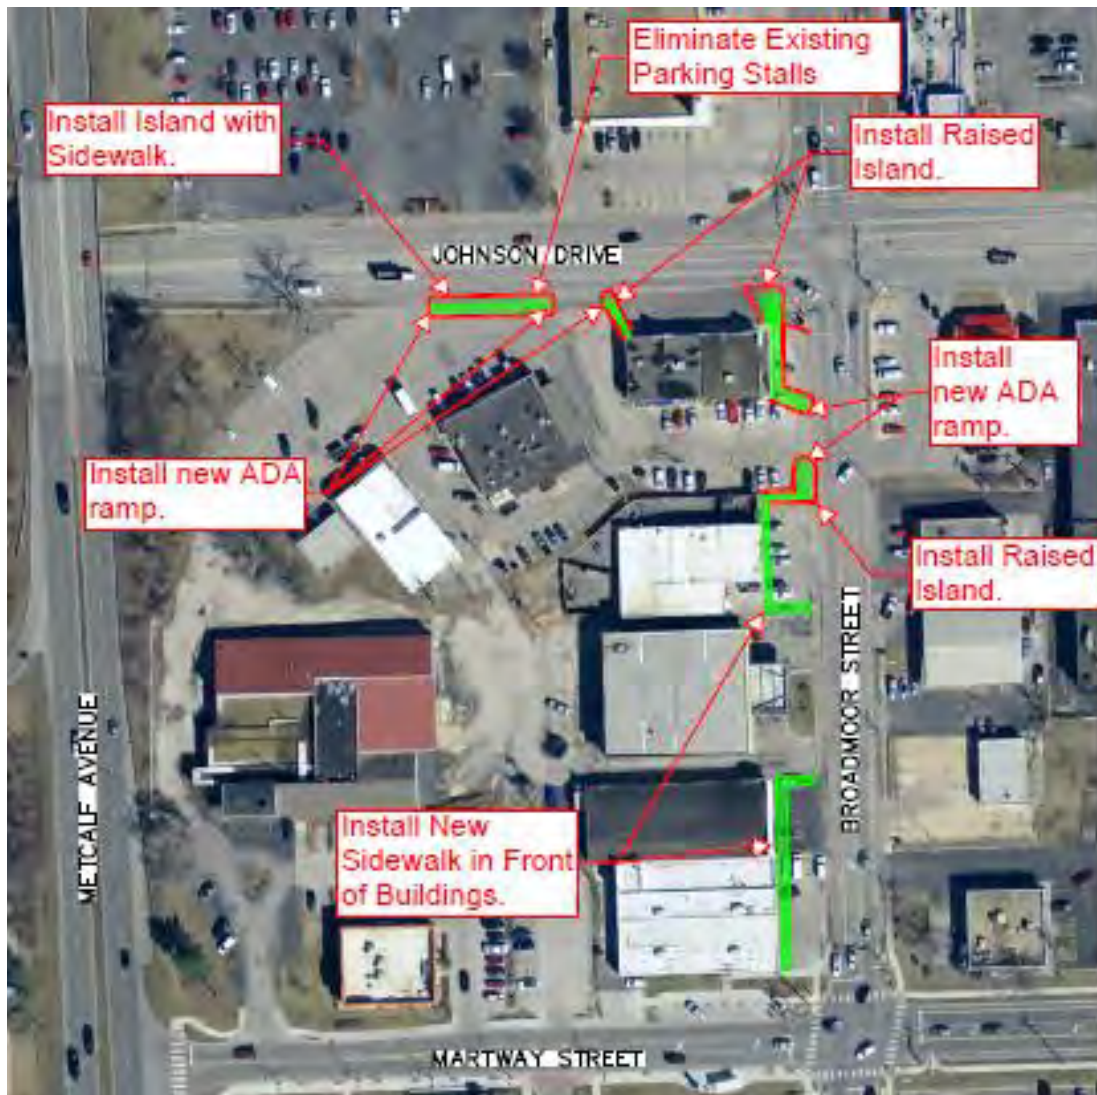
Adding sidewalk infrastructure on Johnson Drive and Broadmoor Street
